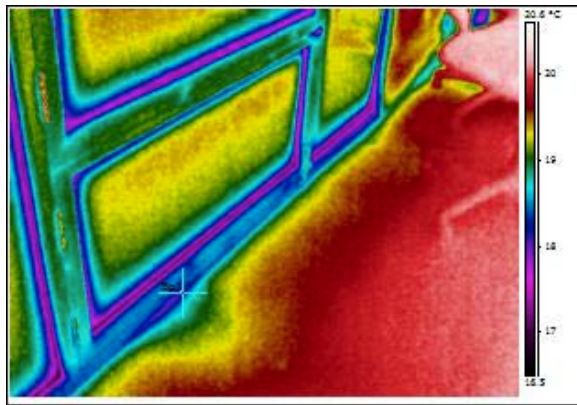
Room F21. The image shows heat loss through the edge of secondary glazing. The smoke test also shows the smoke drawn under the secondary glazing.
